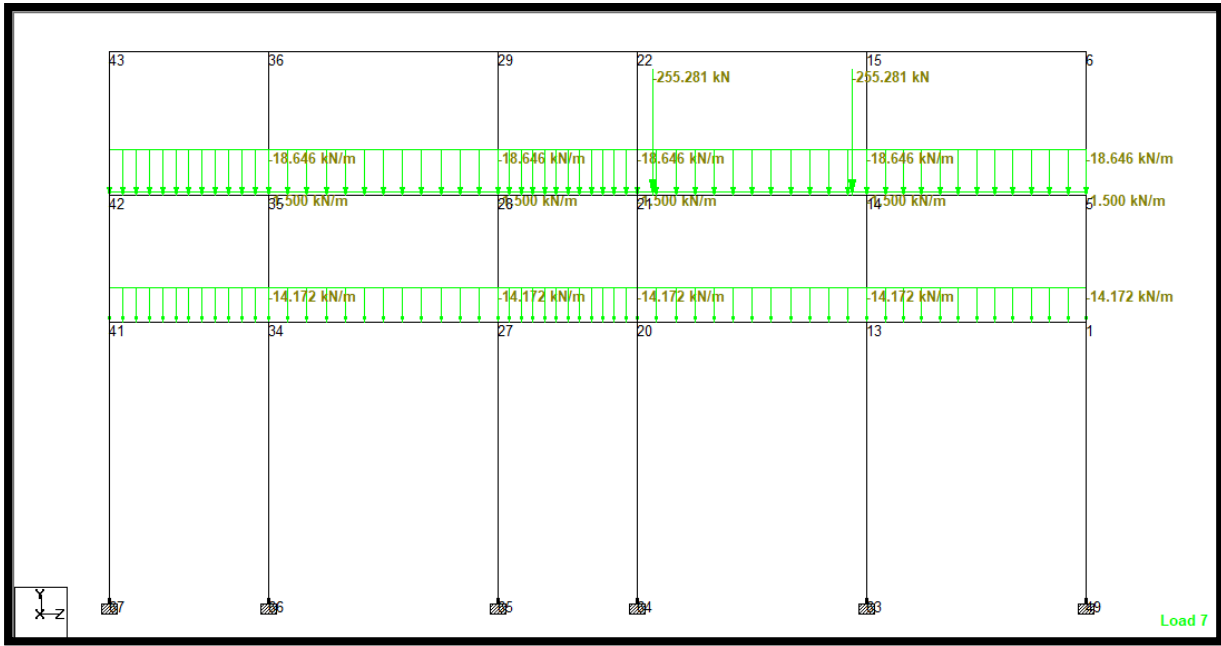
13 Load acting on crane beam (1.5 DL+ 1.05 CL1)
